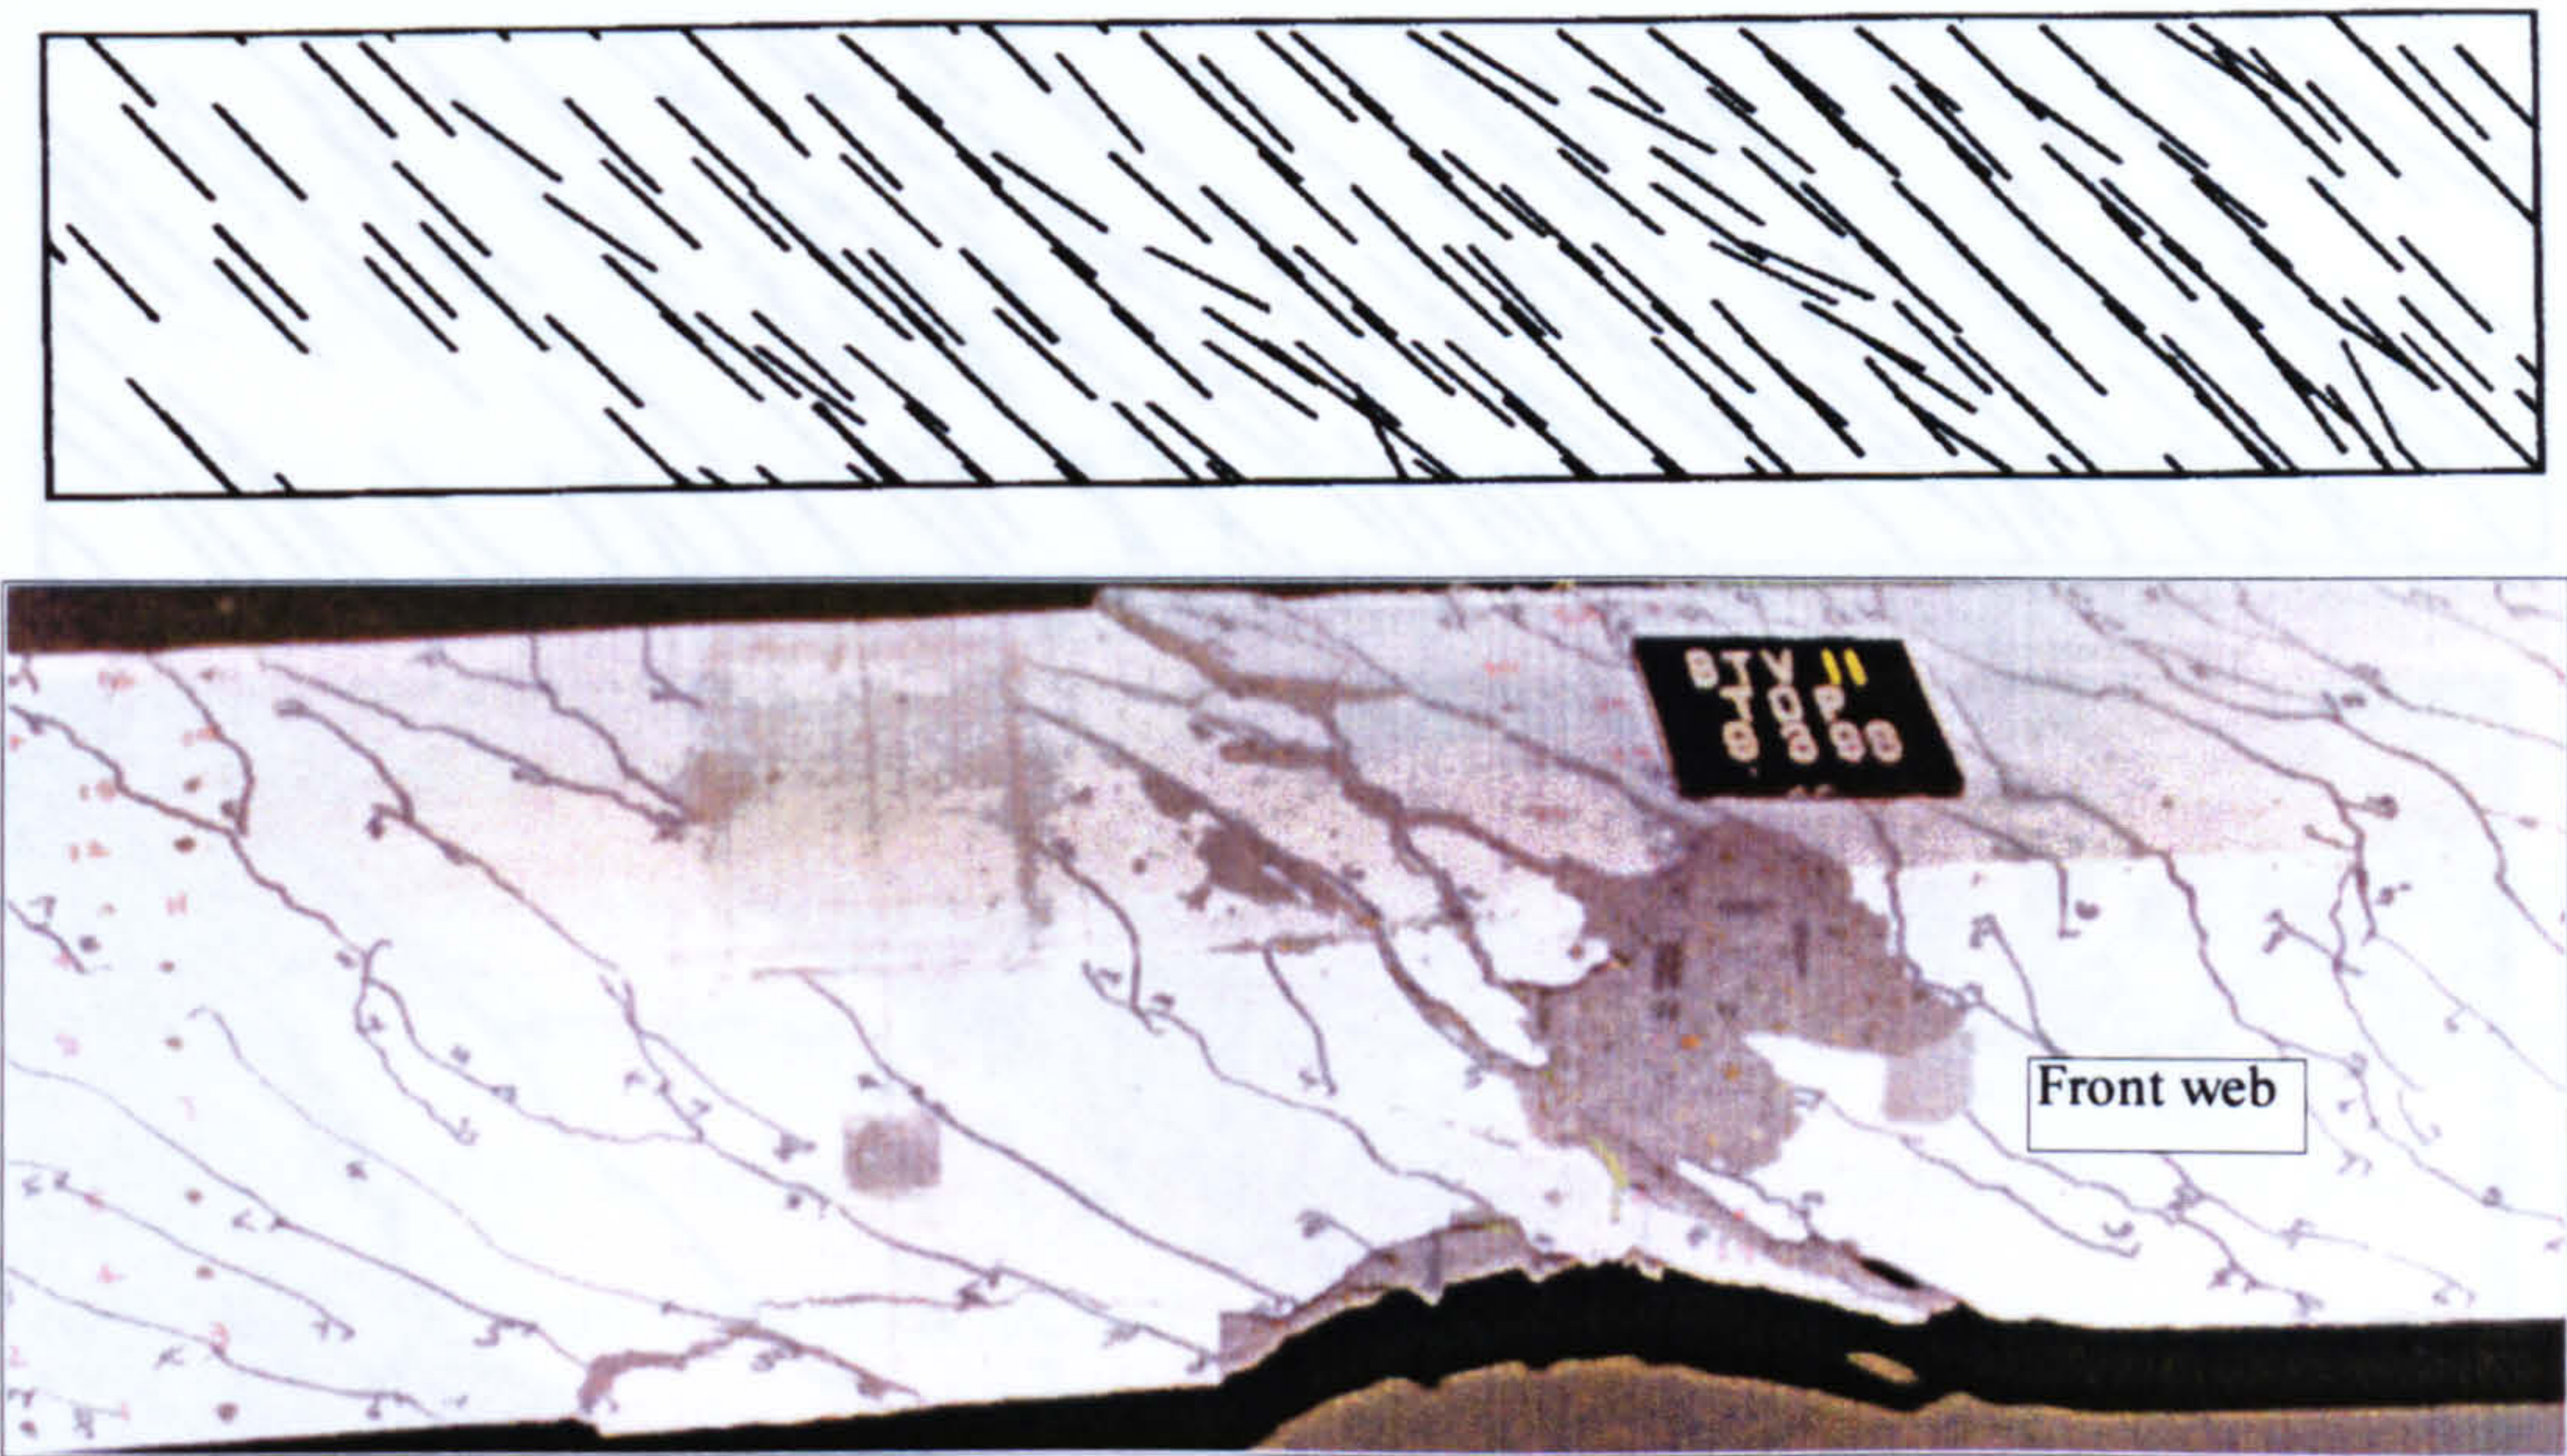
Crack development in the top flange (BTV11)
